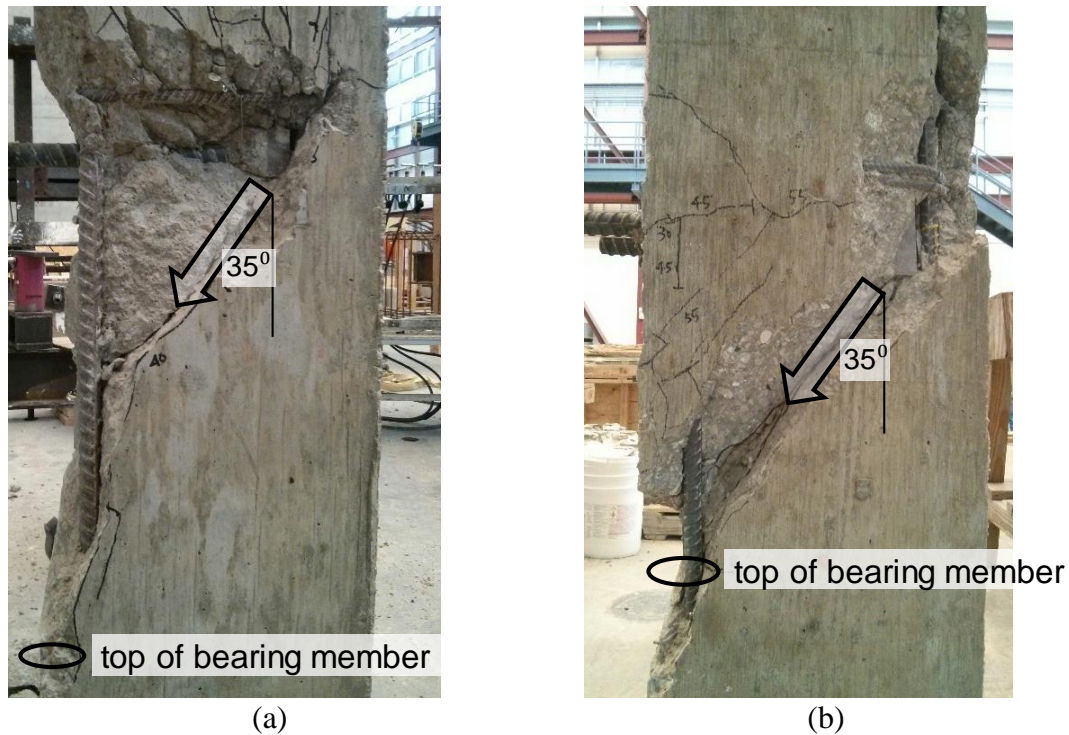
Cracks for specimens with large h_{cl}/ℓ_{eh} ratio and no confining reinforcement (a) specimen 8-5-F4.1-0-i-2.5-3-10-DB (b) specimen (3@5.35)11-5-F8.6-0-i-2.5-3-14.5
